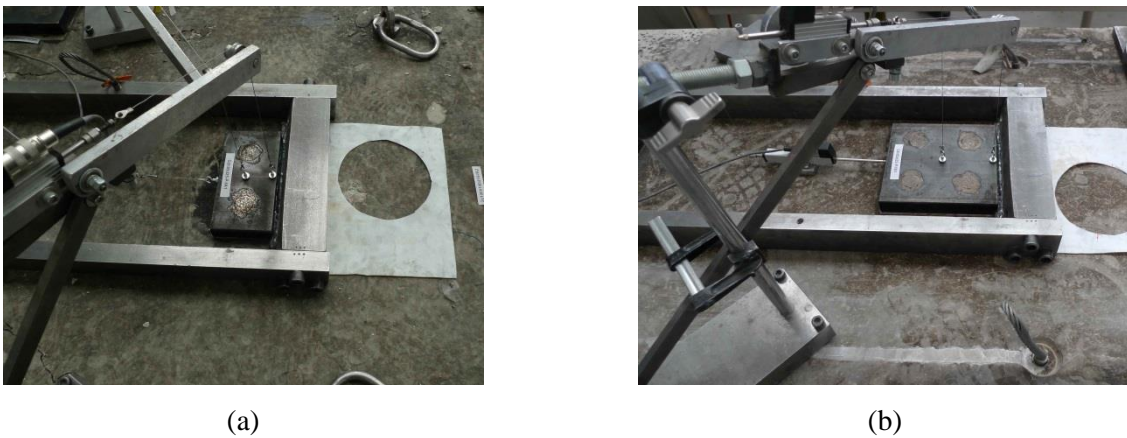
Loading setup for anchor groups: (a) two-stud anchor group; (b) four-stud anchor group.
